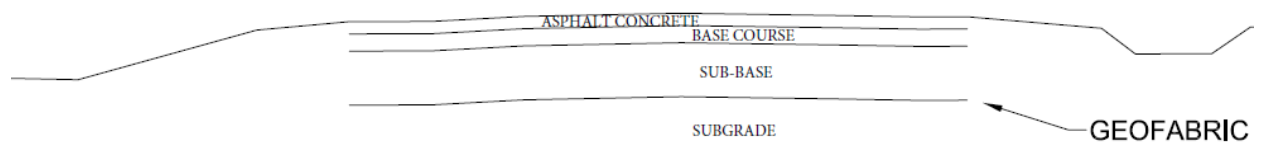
The as-built cross section of the test section FWD4-1. Horizontal scale is equal to vertical scale.
